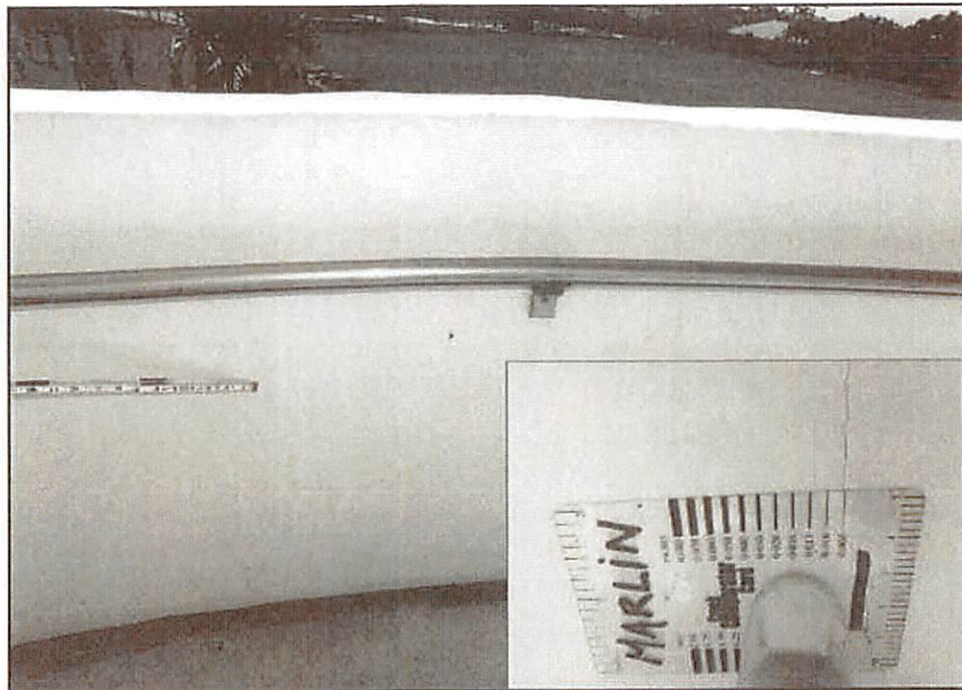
Vertical hairline cracks on the circular ramp exterior wall.
